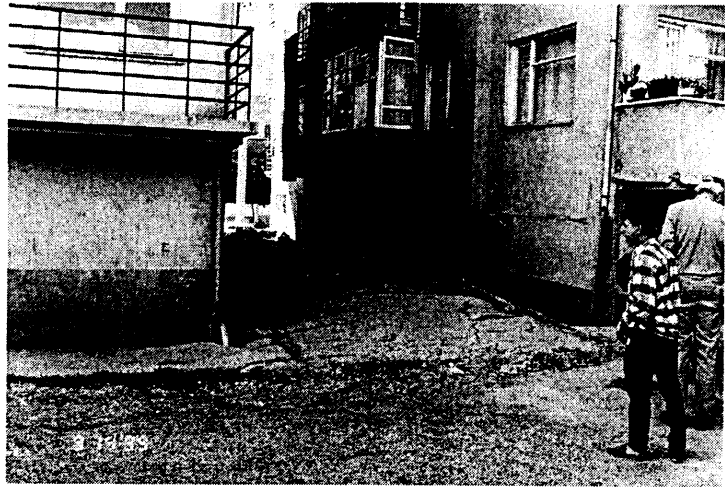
Ground distress observed in alley between buildings C1 and C2. Building C1 is located on the right side of the photograph. (Photo courtesy of I. M. Idriss)
